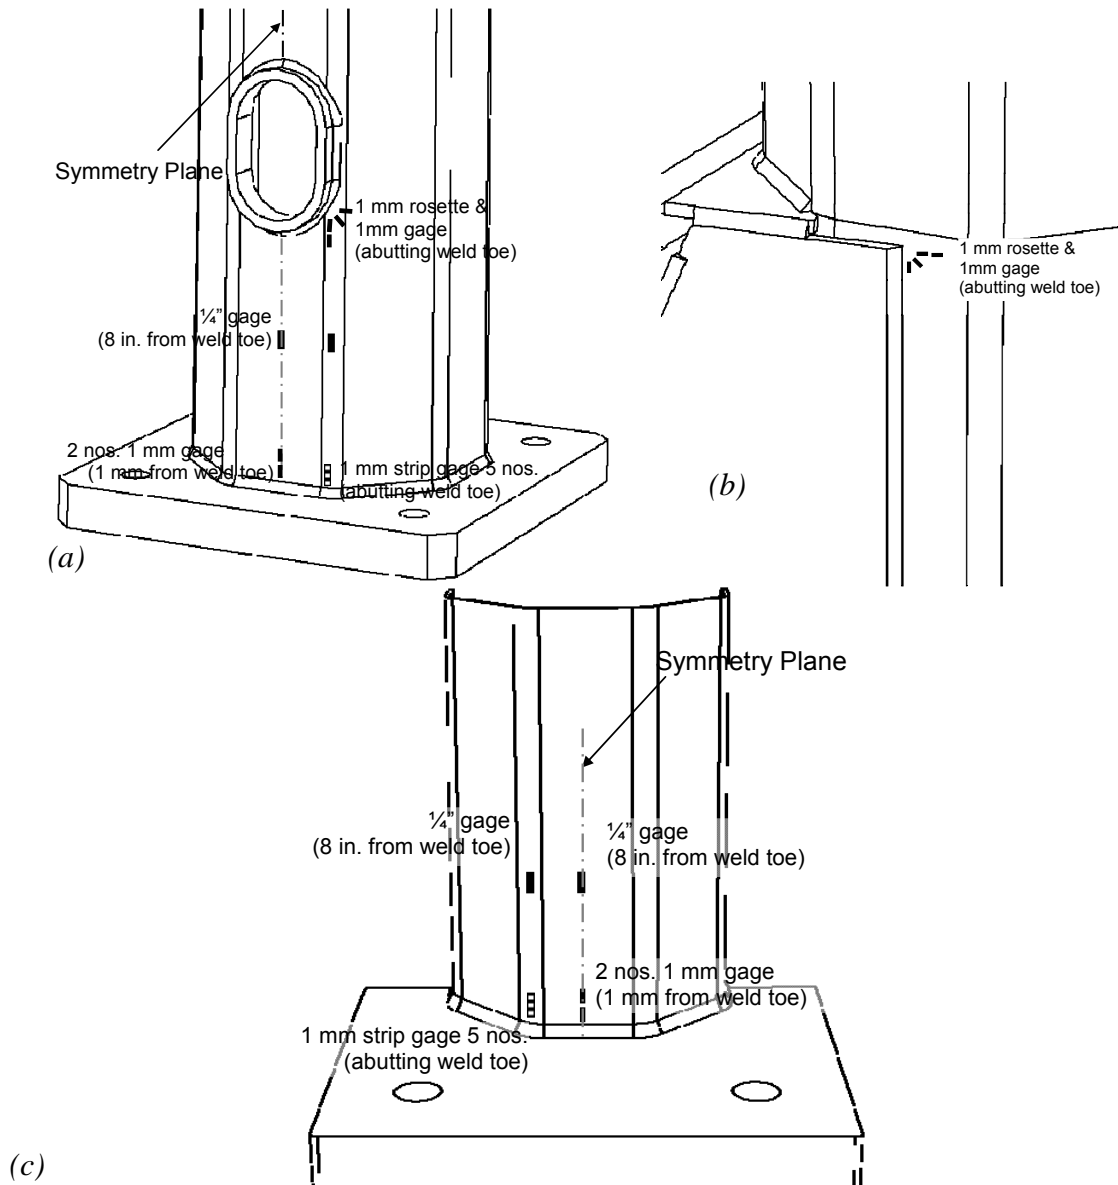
Strain gauge layout in specimen Type VII: (a) pole base and hand hole; (b) side gusset top; (c) arm base
